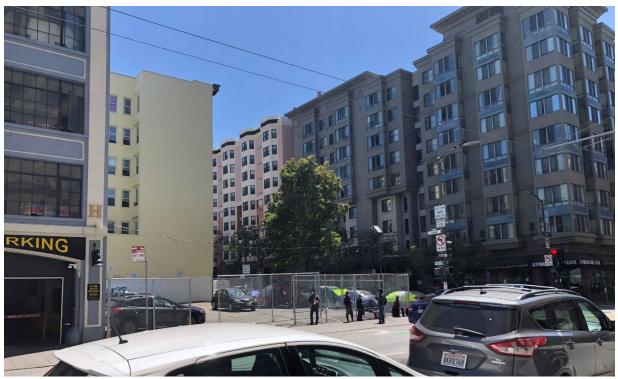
View of the site looking to the southwest. The site is currently fenced along the Jones Street frontage to the west and the Turk Street frontage to the north.
